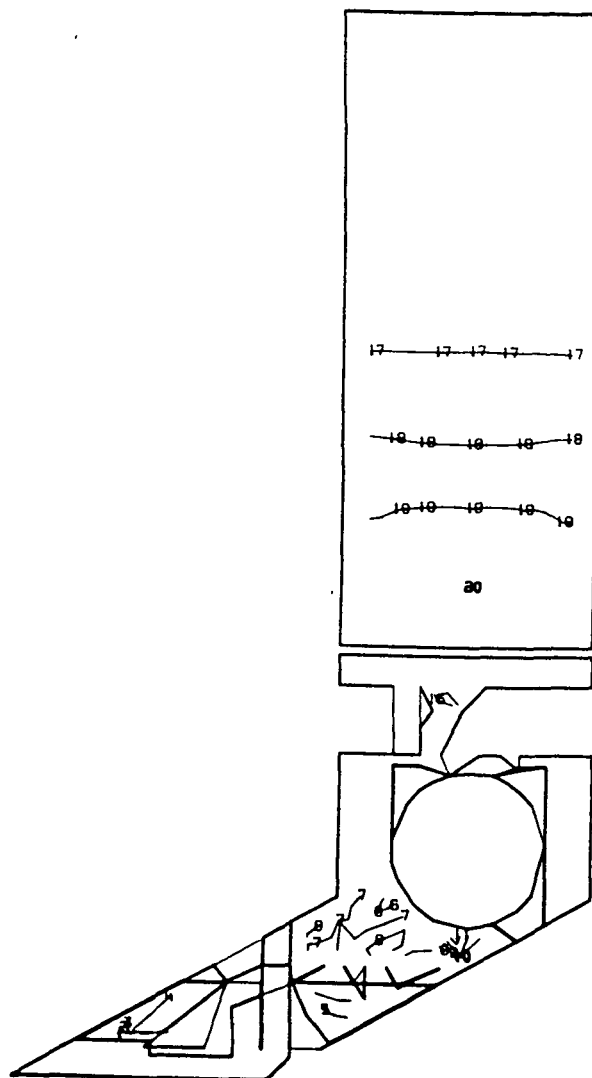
Model 02, View 1, Shroud Outside
